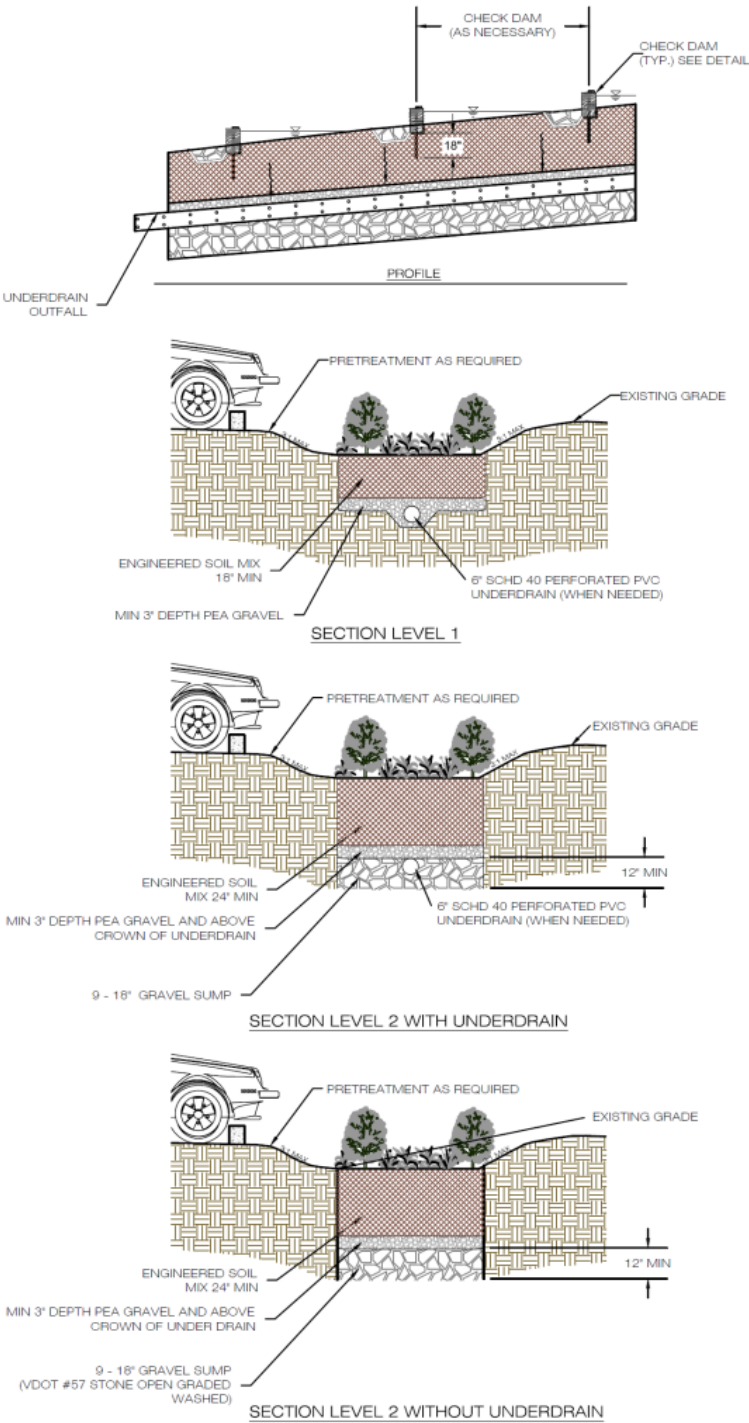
Typical Details for Level 1 and 2 Water Quality Swales (source: VADCR, 2011)
